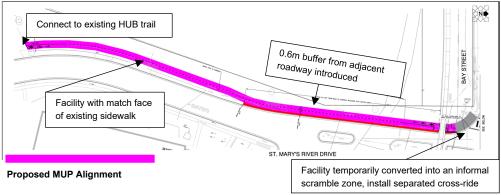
Section of the proposed route alignment's roll plan, between the Boardwalk and Bay St
